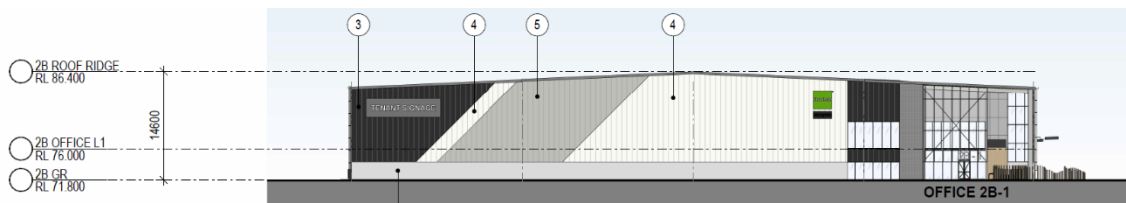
Warehouse 2B North Elevation (Source: SBA Architects)
